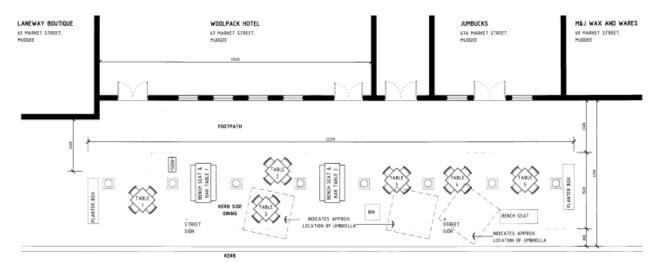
Outdoor Seating Plan – Woolpack Hotel
